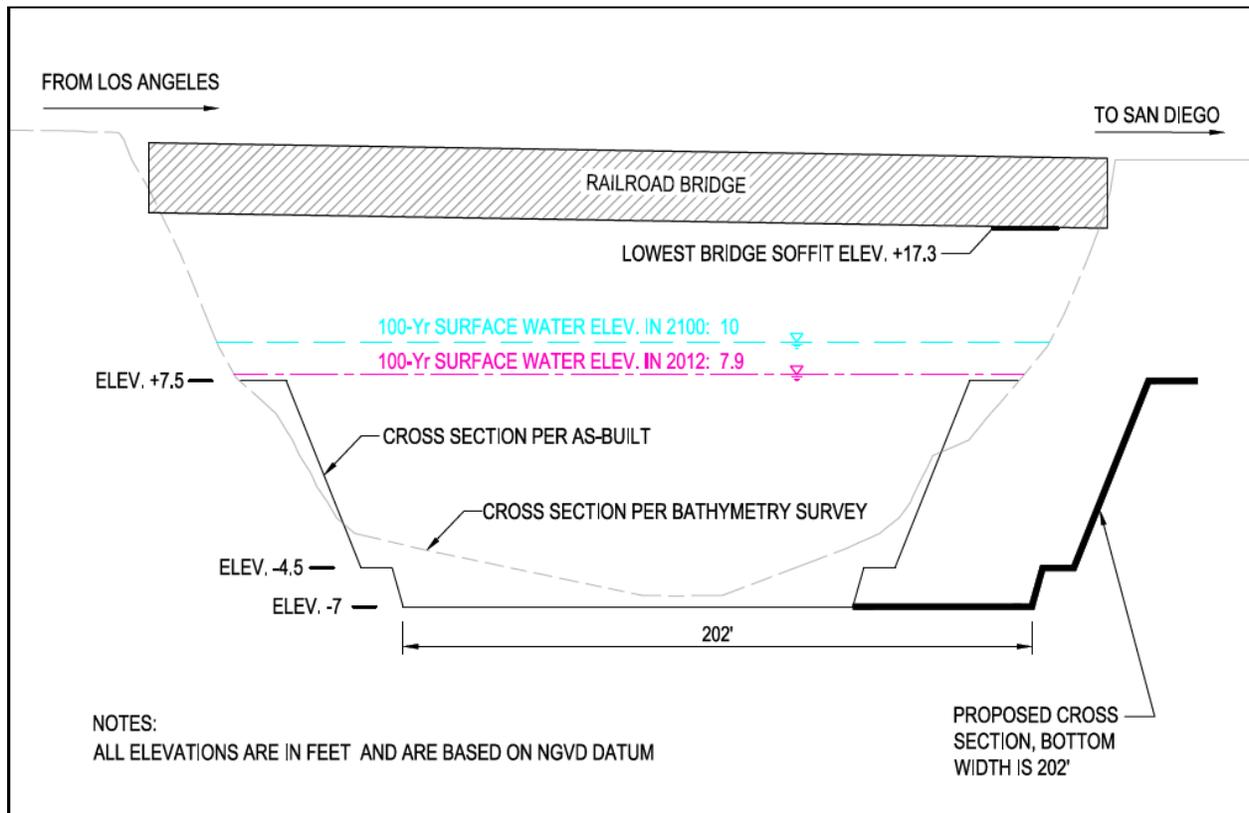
Channel Cross-Section Under the Railroad Bridge
